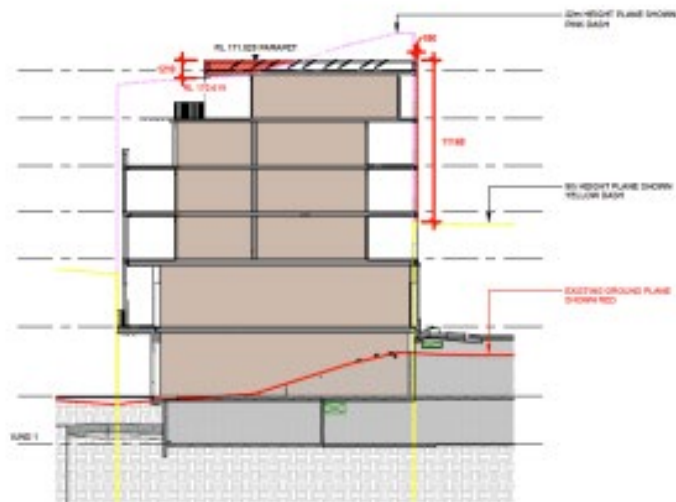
Cross section 3 – Building C (Cox drawing DA-99-07)
